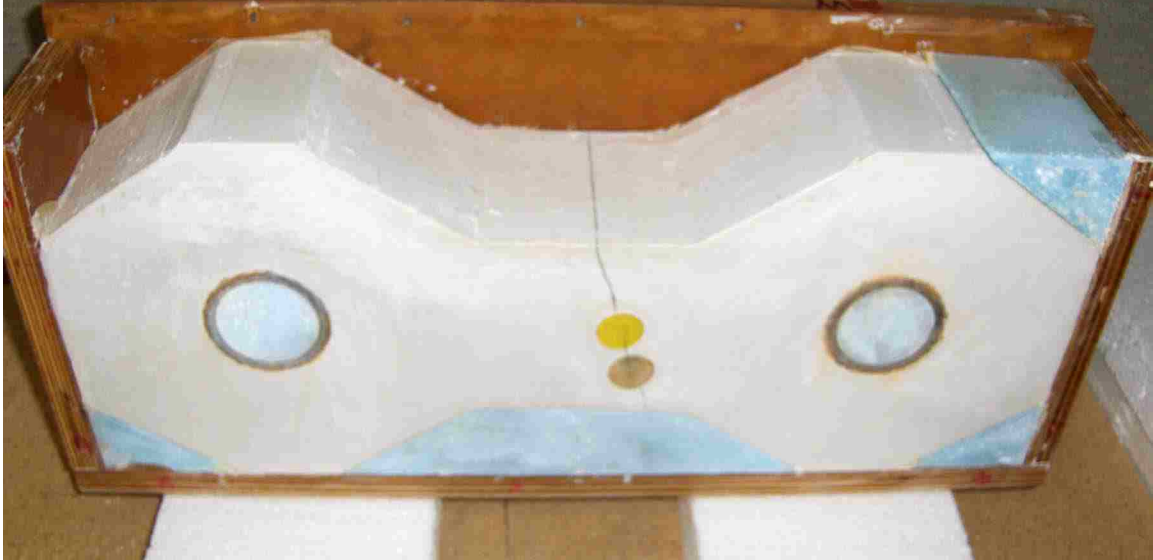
Mold Removal of Dog Bone 3 Showing Crack
